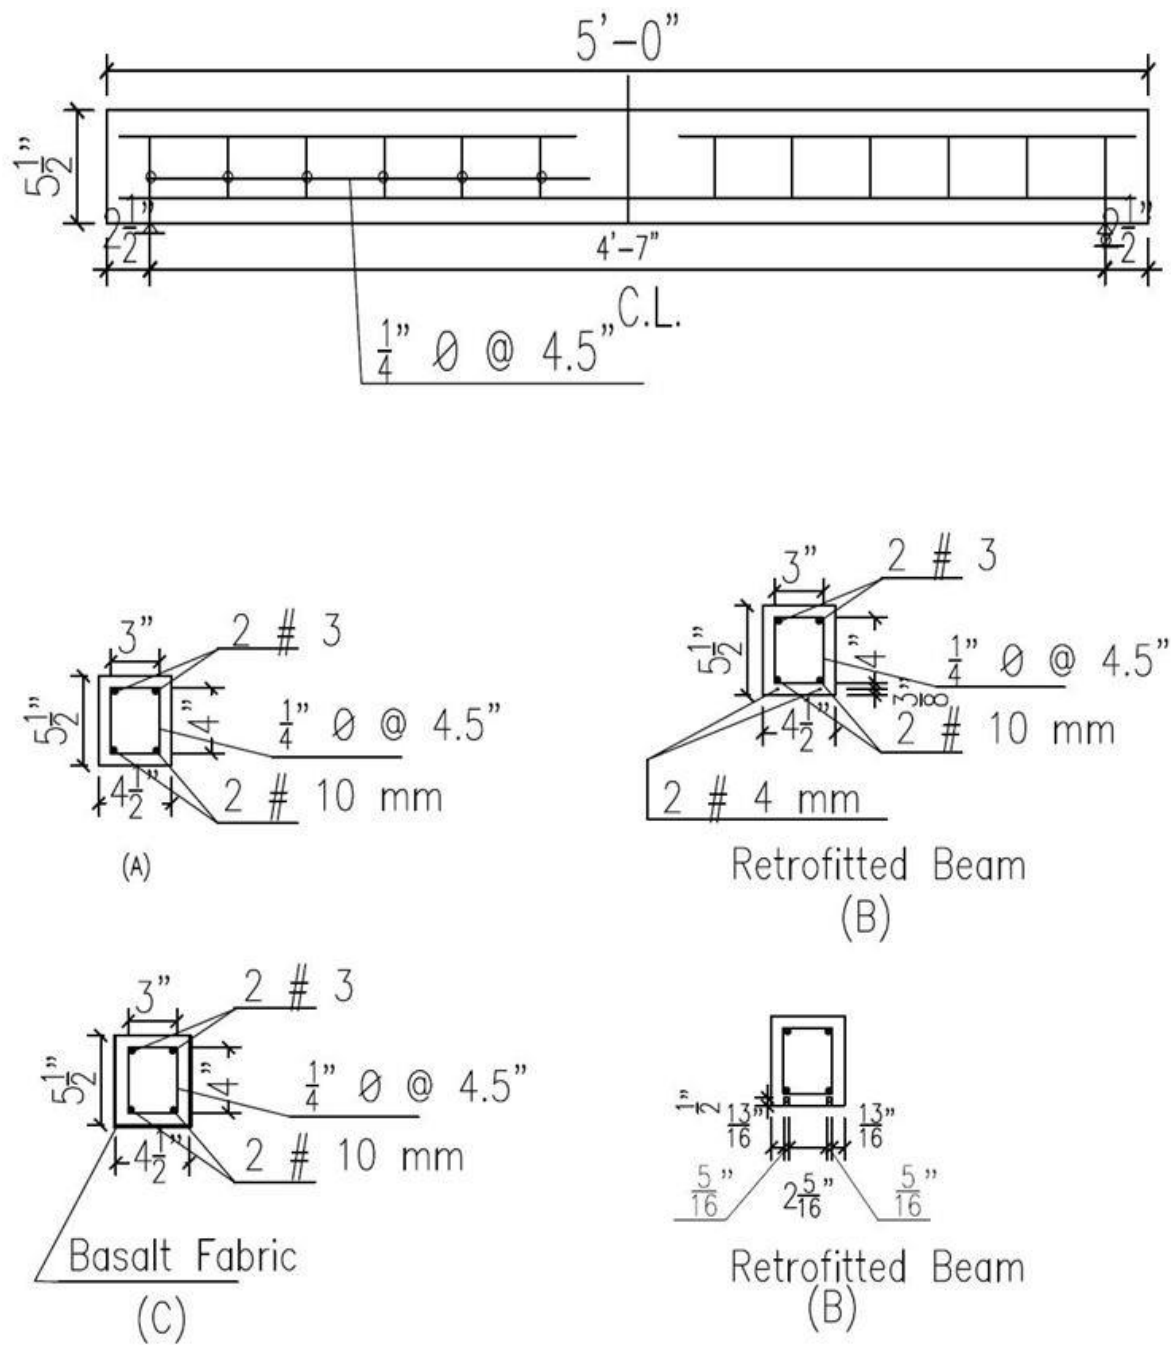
Typical Cross-section for the Simply Supported Beam with BFRP Tension Only
